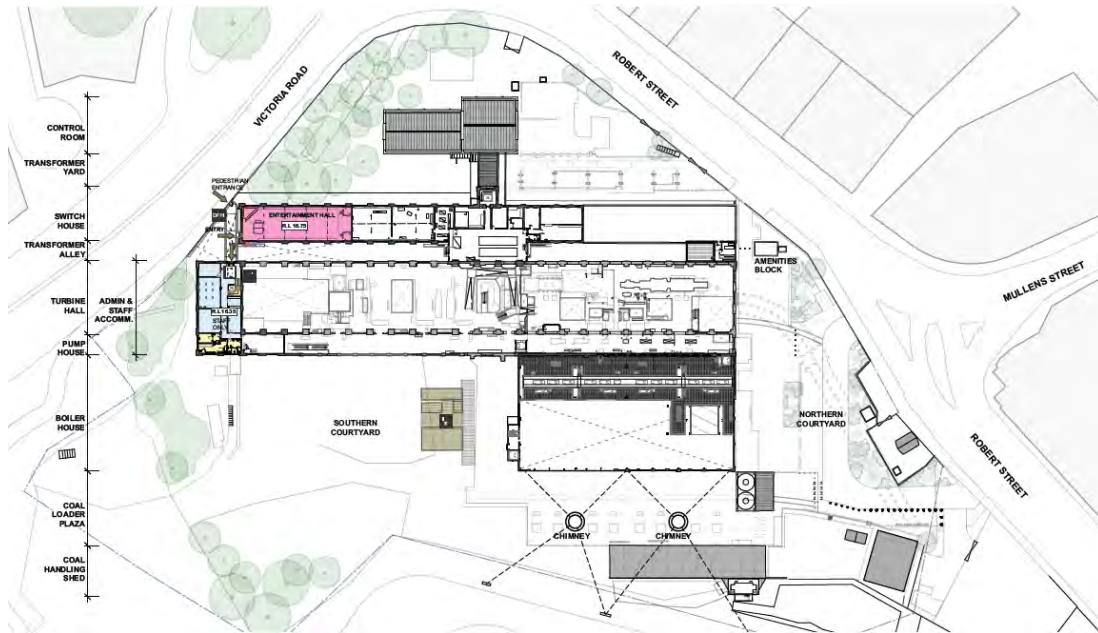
White Bay Power Station – Ground Floor (Design 5 Architects)
